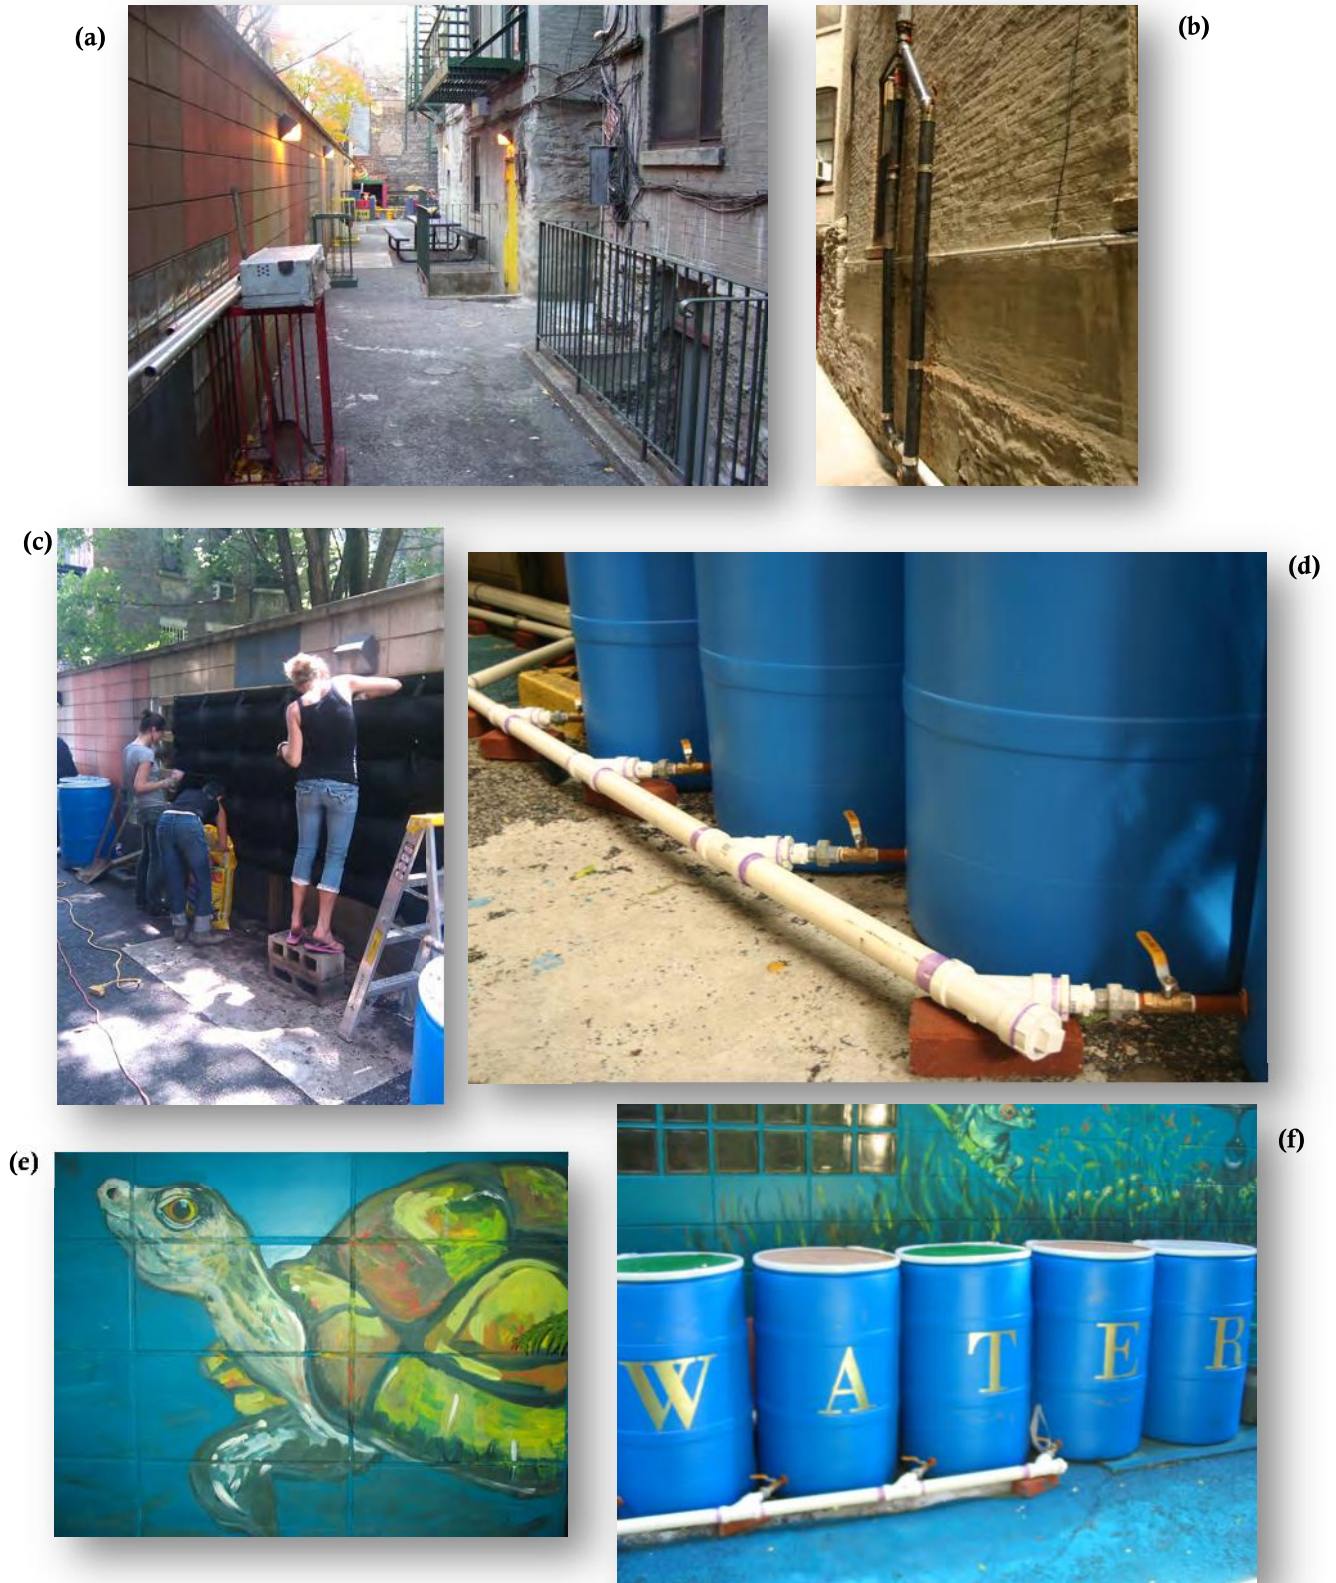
83rd Street Preschool project (a), playground before project (b), completed downspout disconnection (c), filling pocket planters (d), series of rain barrels (e), and mural open house (f). Photo credit: Tatiana Morin with New York City Soil Water Conservation District.
